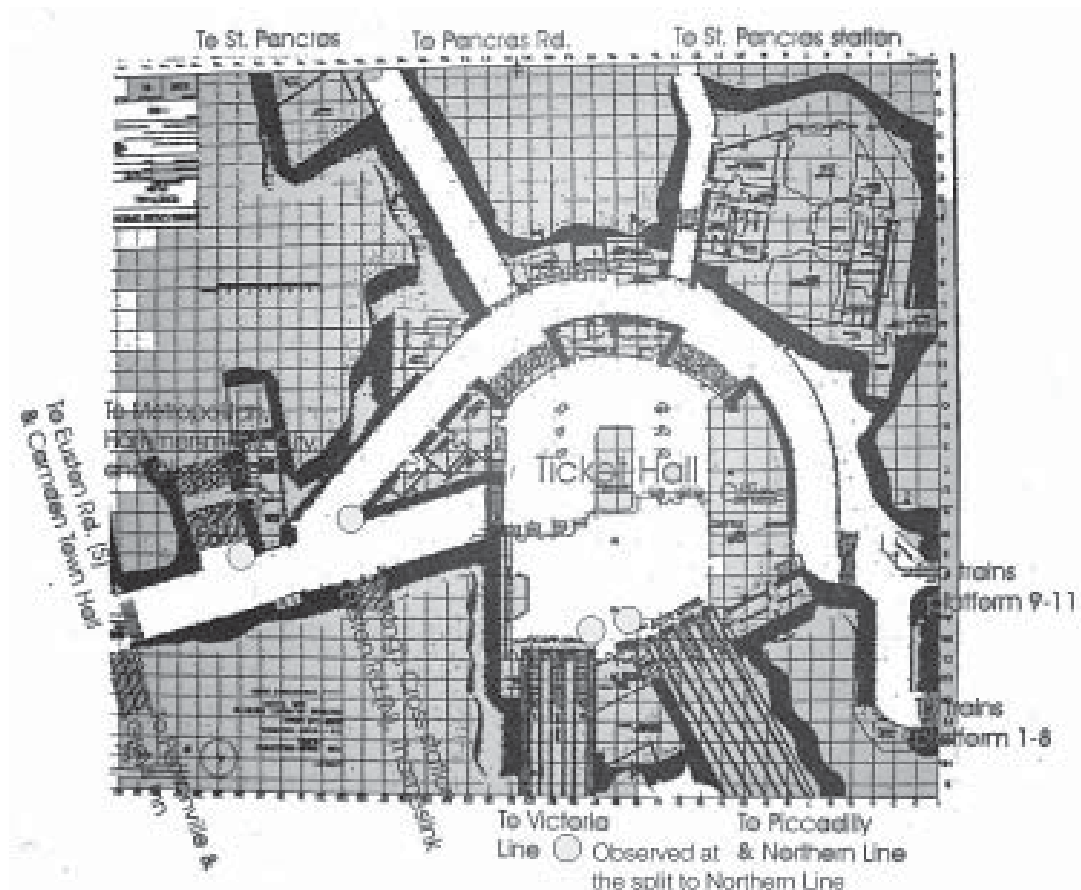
A Observation Locations at King's Cross Underground station, plan at ticket hall level (LUL 1996)
